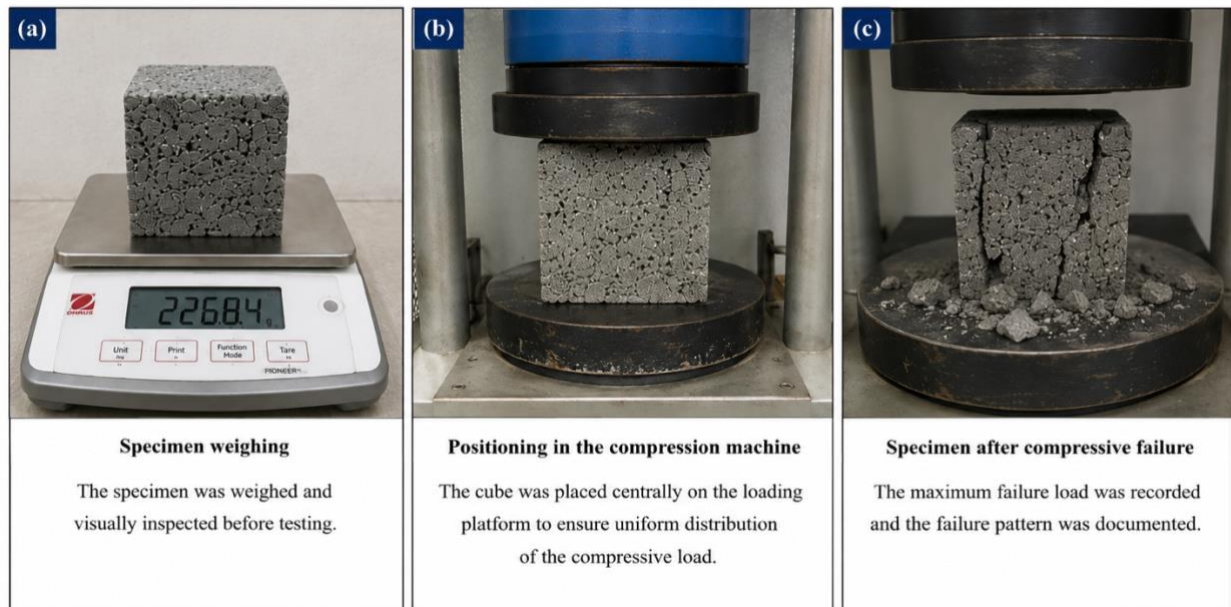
Compressive strength testing: (a) specimen weighing; (b) positioning of the cube in the compression testing machine; and (c) specimen after compressive failure.
